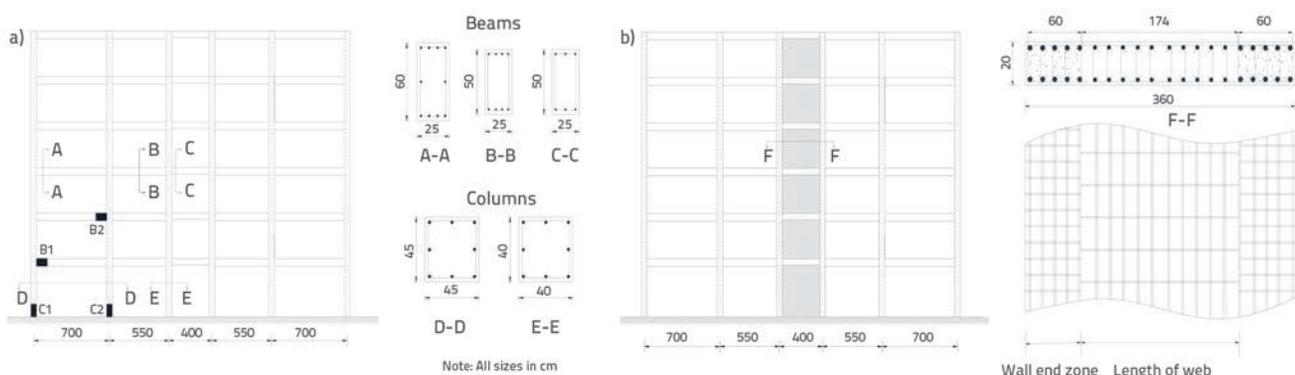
a) existing building with structural elements; b) retrofitted buildings with structural elements
